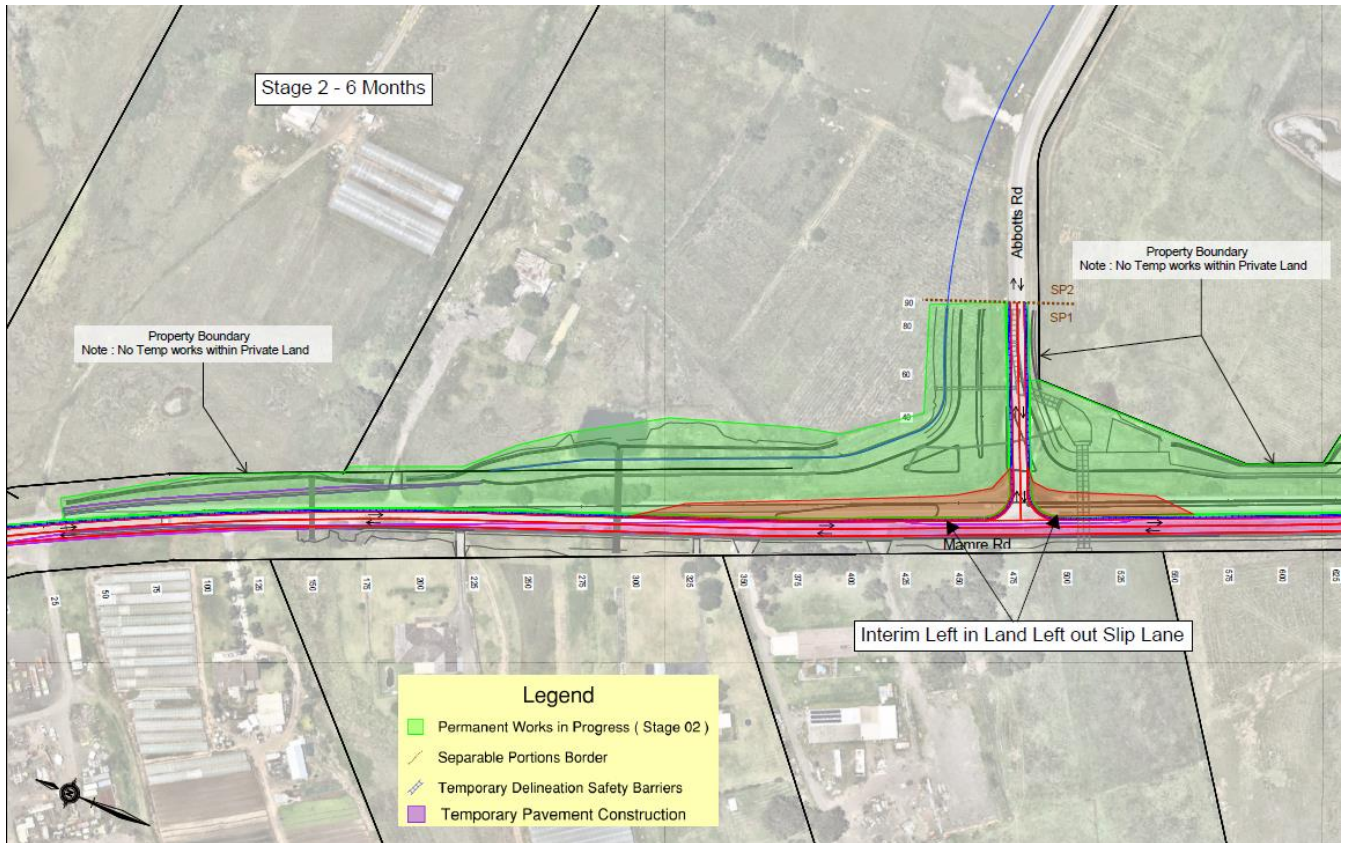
Mamre Road/ Abbotts Road Upgrade Layout- Construction Stage 2
